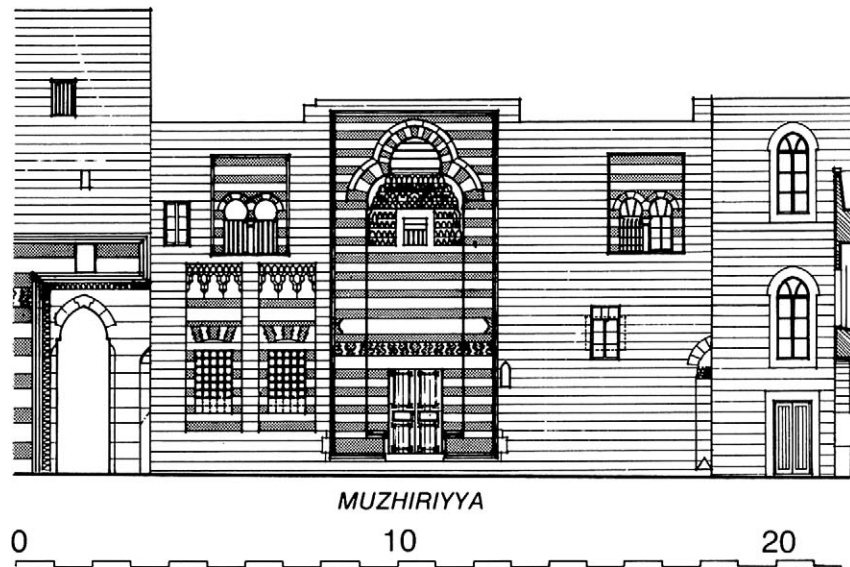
Ṭarīq Bāb al-Ḥadīd*: Elevation of south side
